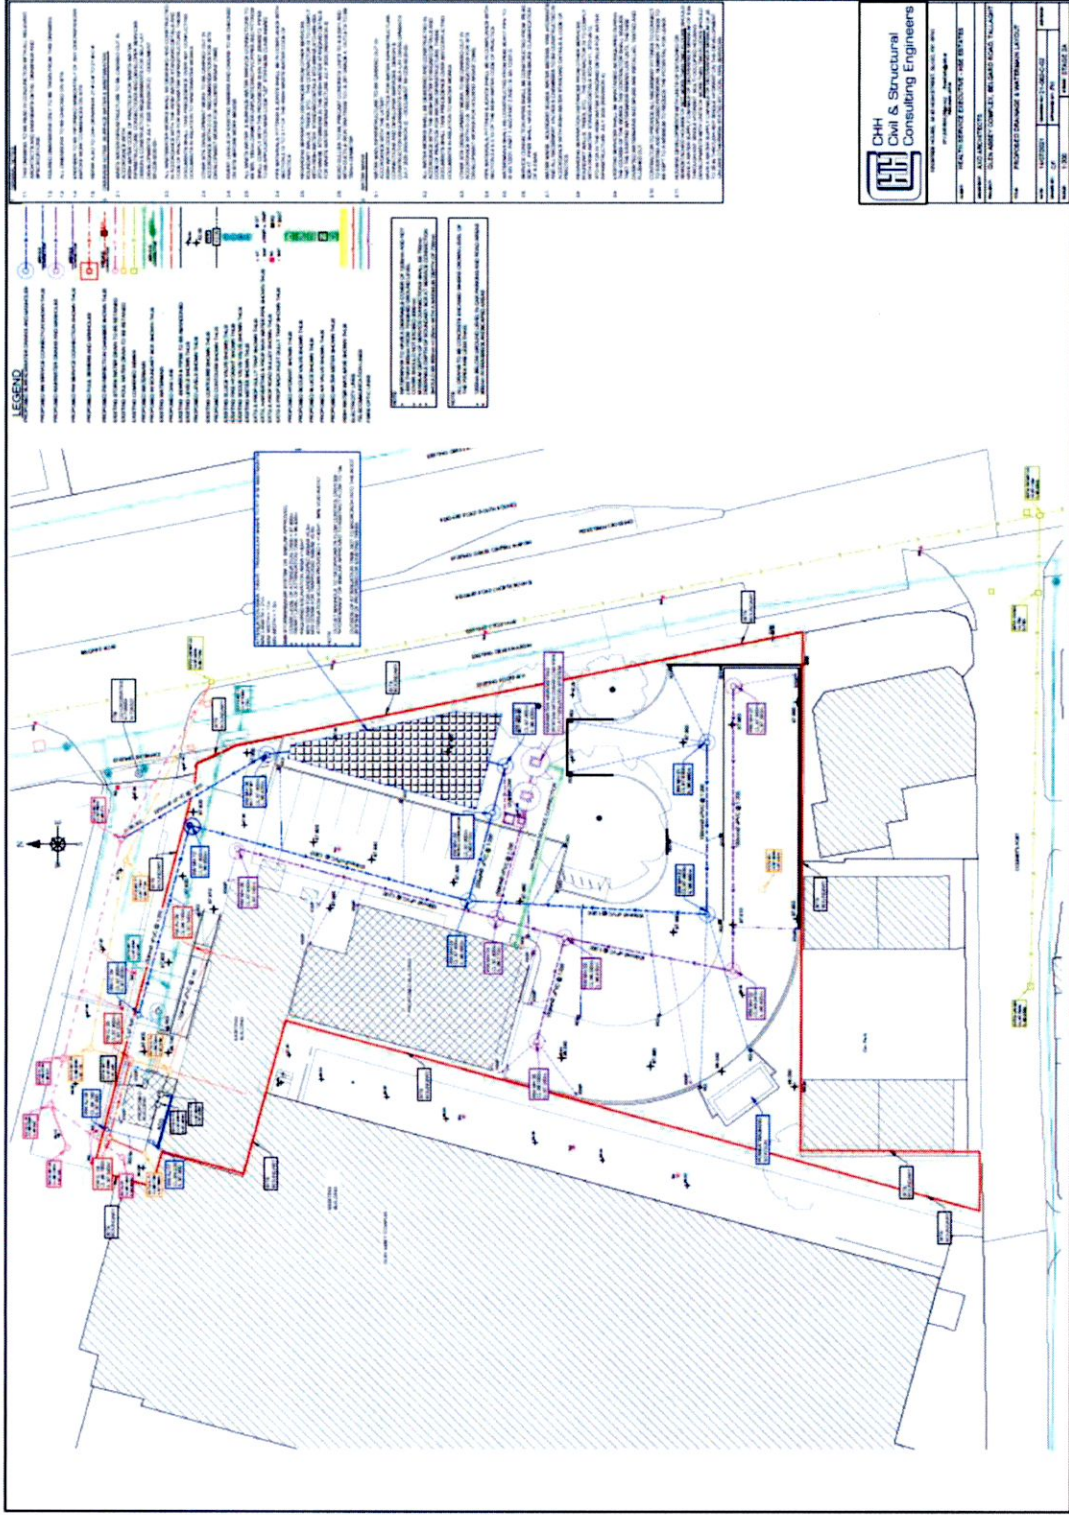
PROPOSED DRAINAGE AND WATERMAIN LAYOUT (CHH CIVIL & STRUCTURAL CONSULTING ENGINEERS)
